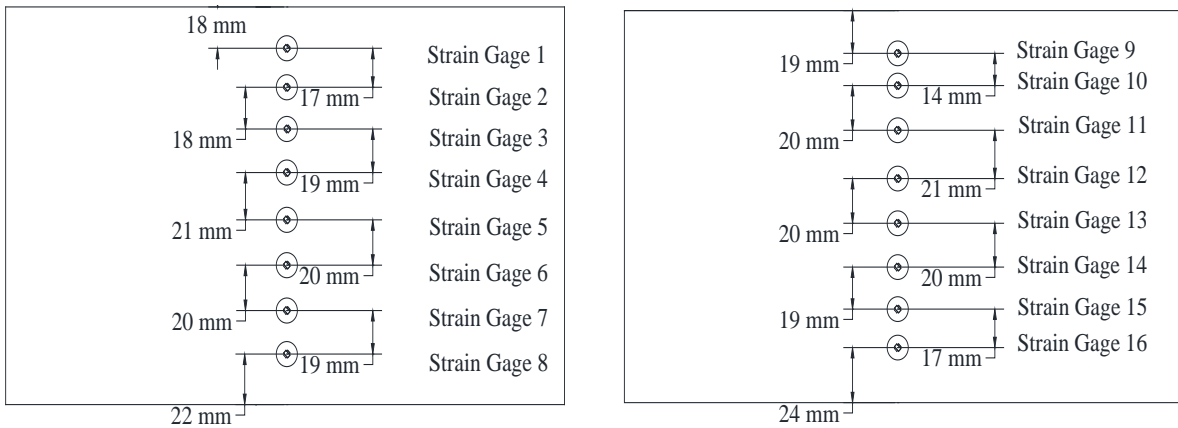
Strain gage layout in Tests 1A-R2, 2, and 6 (inner side of wall).
